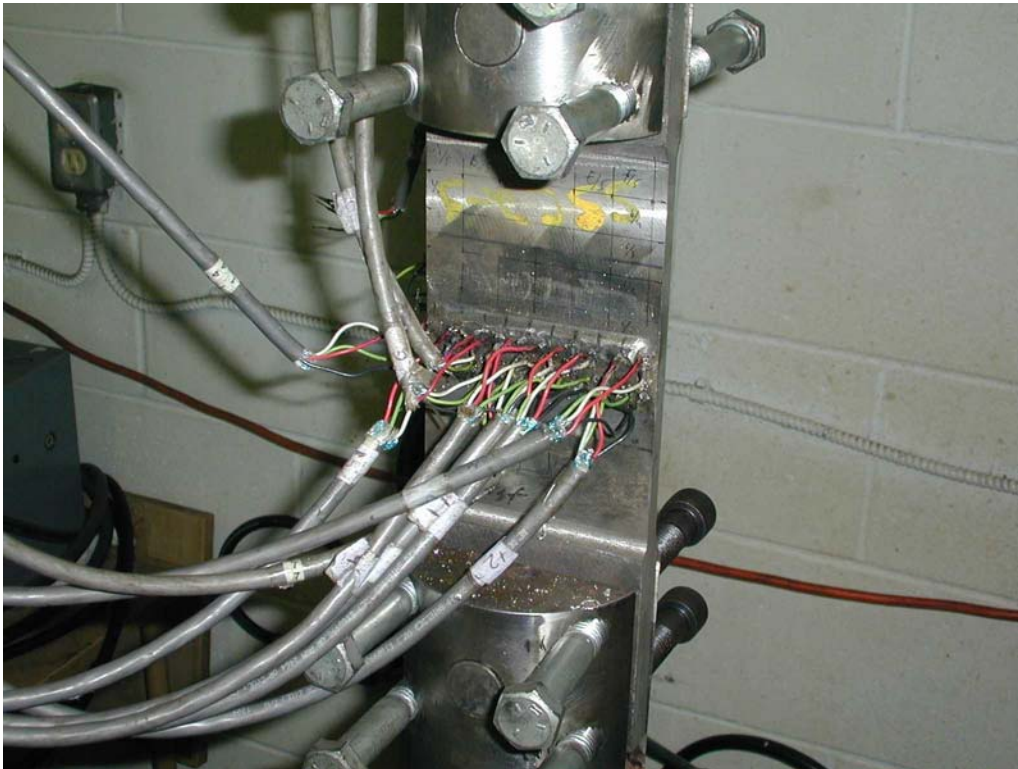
Specimen with PD Probes Installed in the Fatigue Testing Rig
